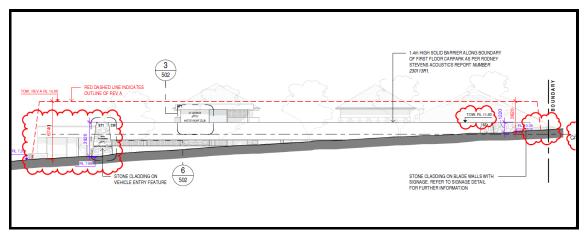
Amended Plimsoll Street elevation (Source: Innovate, Revision F)
